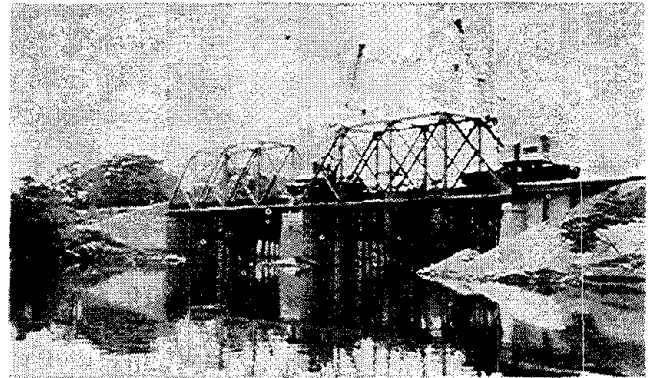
Installation of new trusses Cotaxtla River Bridge.
